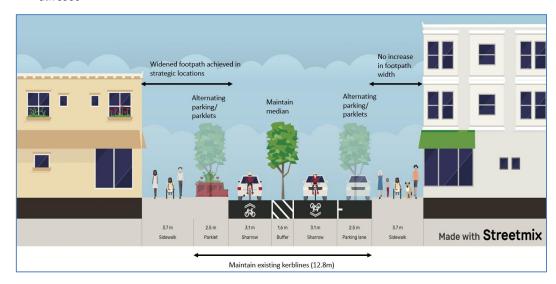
Proposed cross-section enhancement for Albany Highway (typical treatment outside urban cores)
